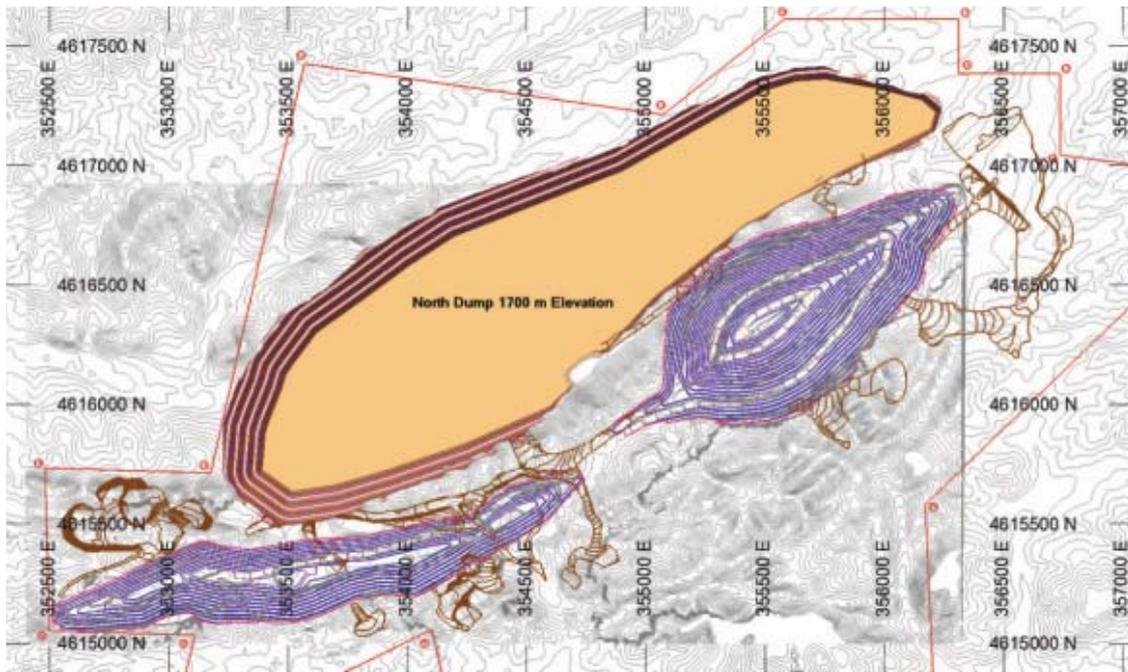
Open-pit and waste dump design for the Northeast Zone and Southwest Zone
